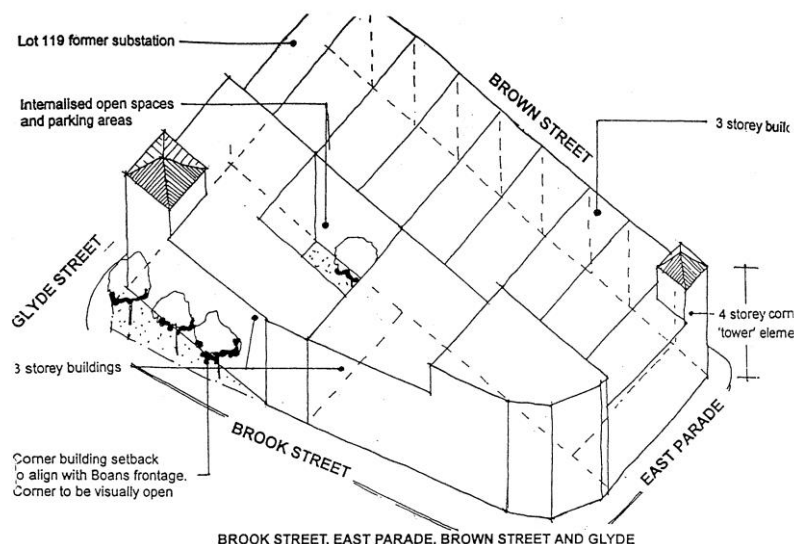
Brook Street, East Parade, Brown Street and Glide Street
